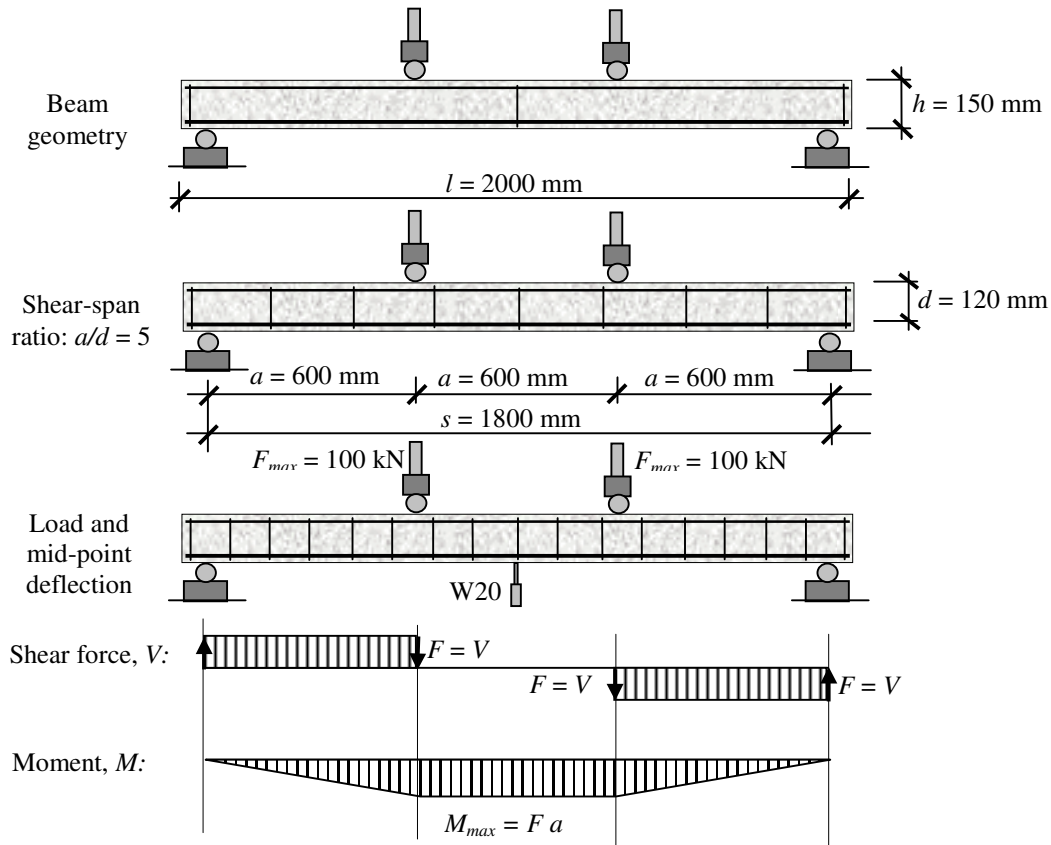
Detail of conventional reinforcements for steel fibre reinforced concrete beam series RC-A and RC-B
